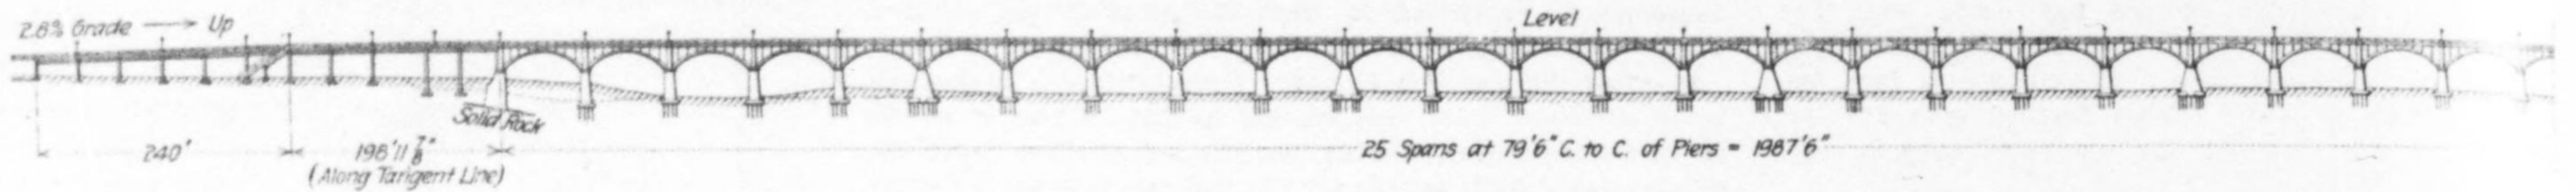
GENERAL ELEVATION AND PART PLAN OF
